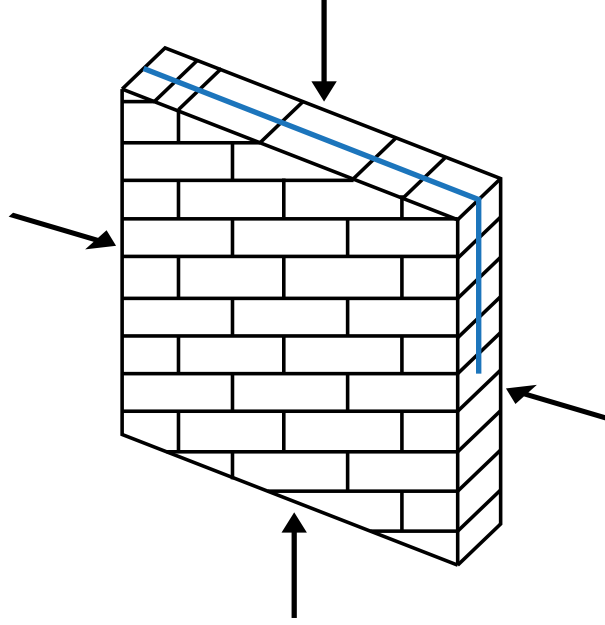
Failure modes of solid clay units masonry under biaxial compression-compression, from [Page \(1981\)](#).
